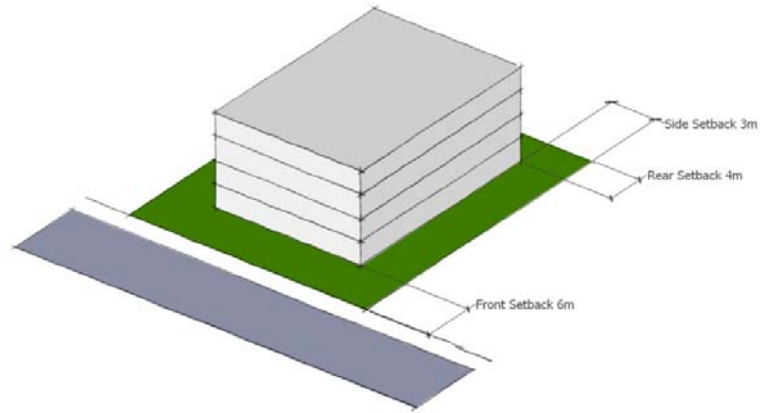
c – Setbacks – 3 or 4 storey Multiple dwellings
